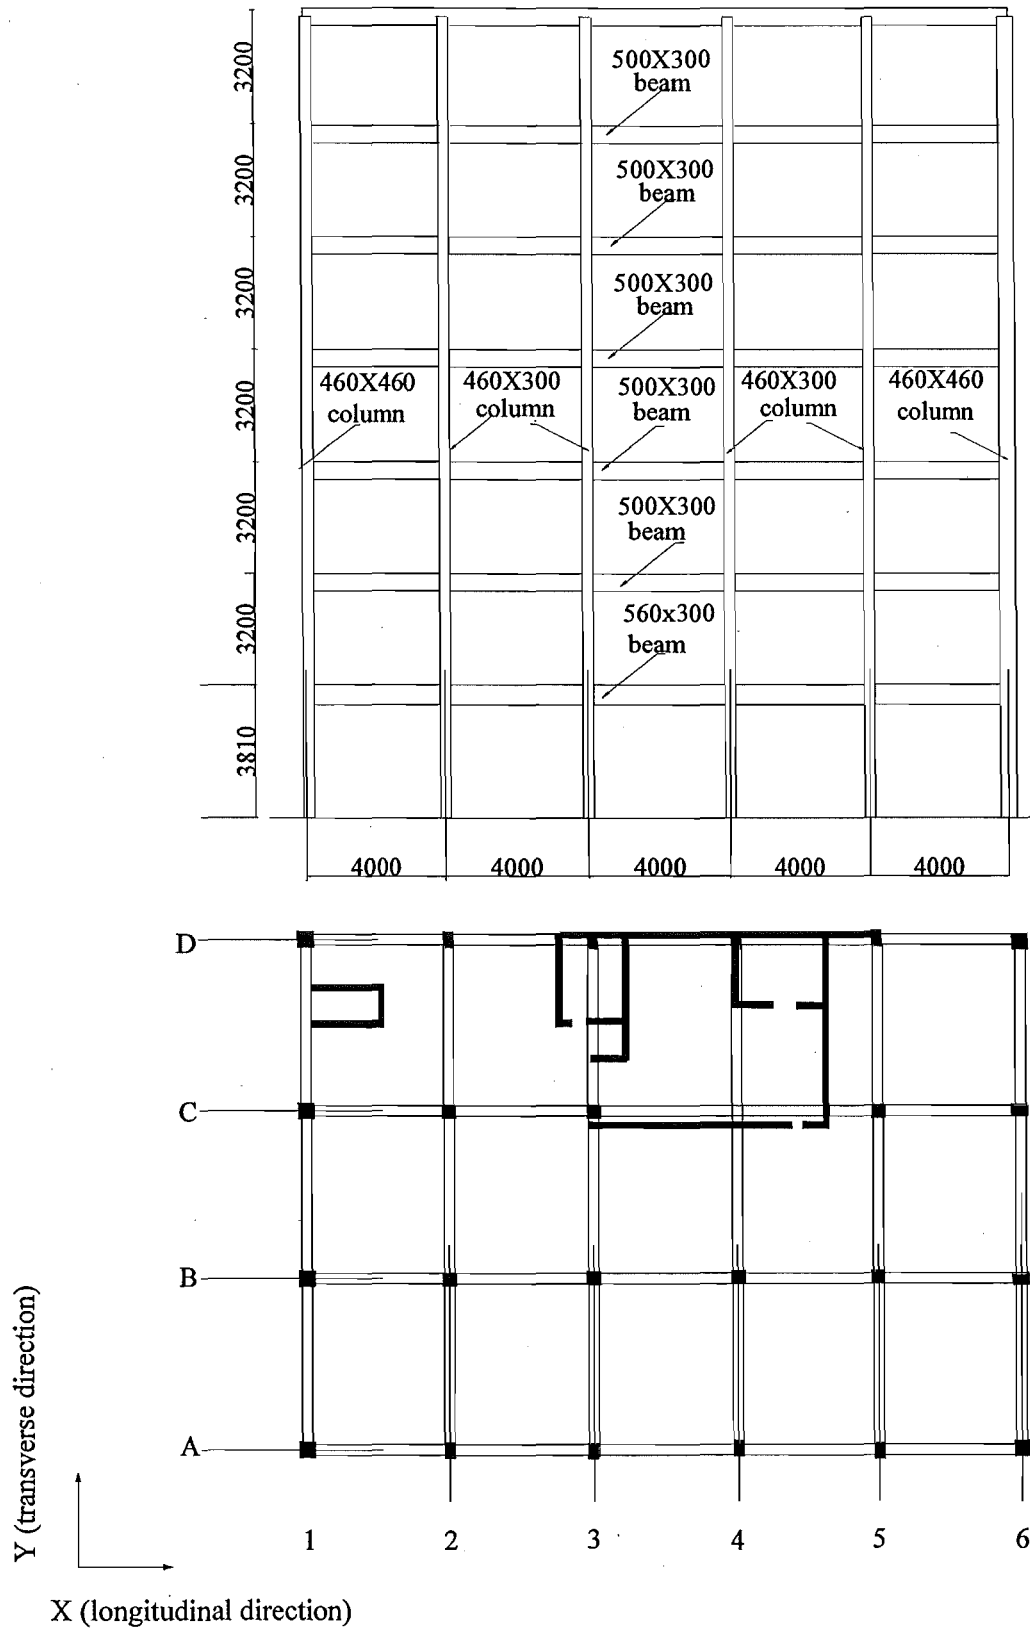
The Subject Reinforced Concrete Frame Structure
